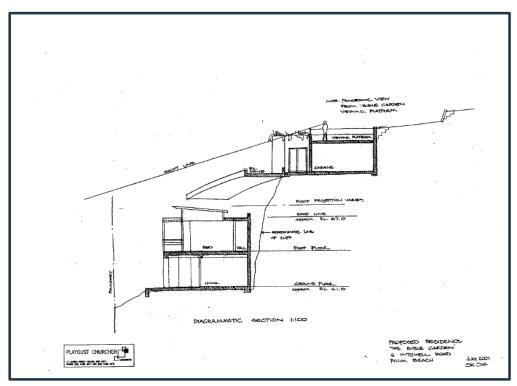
Concept Architectural Plans Detailing location of Garage on southern portion of 6 Mitchell Road with associated viewing platform (Source: Heads of Agreement Contract 2004)
